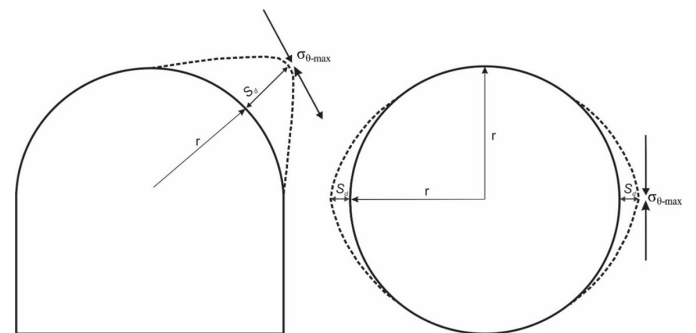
Both drill and blast and TBM excavated tunnels showing potential damage zone in the tunnel wall (depth-impact, S_d) due to induced tangential compressional stress (Panahi, 2018).
